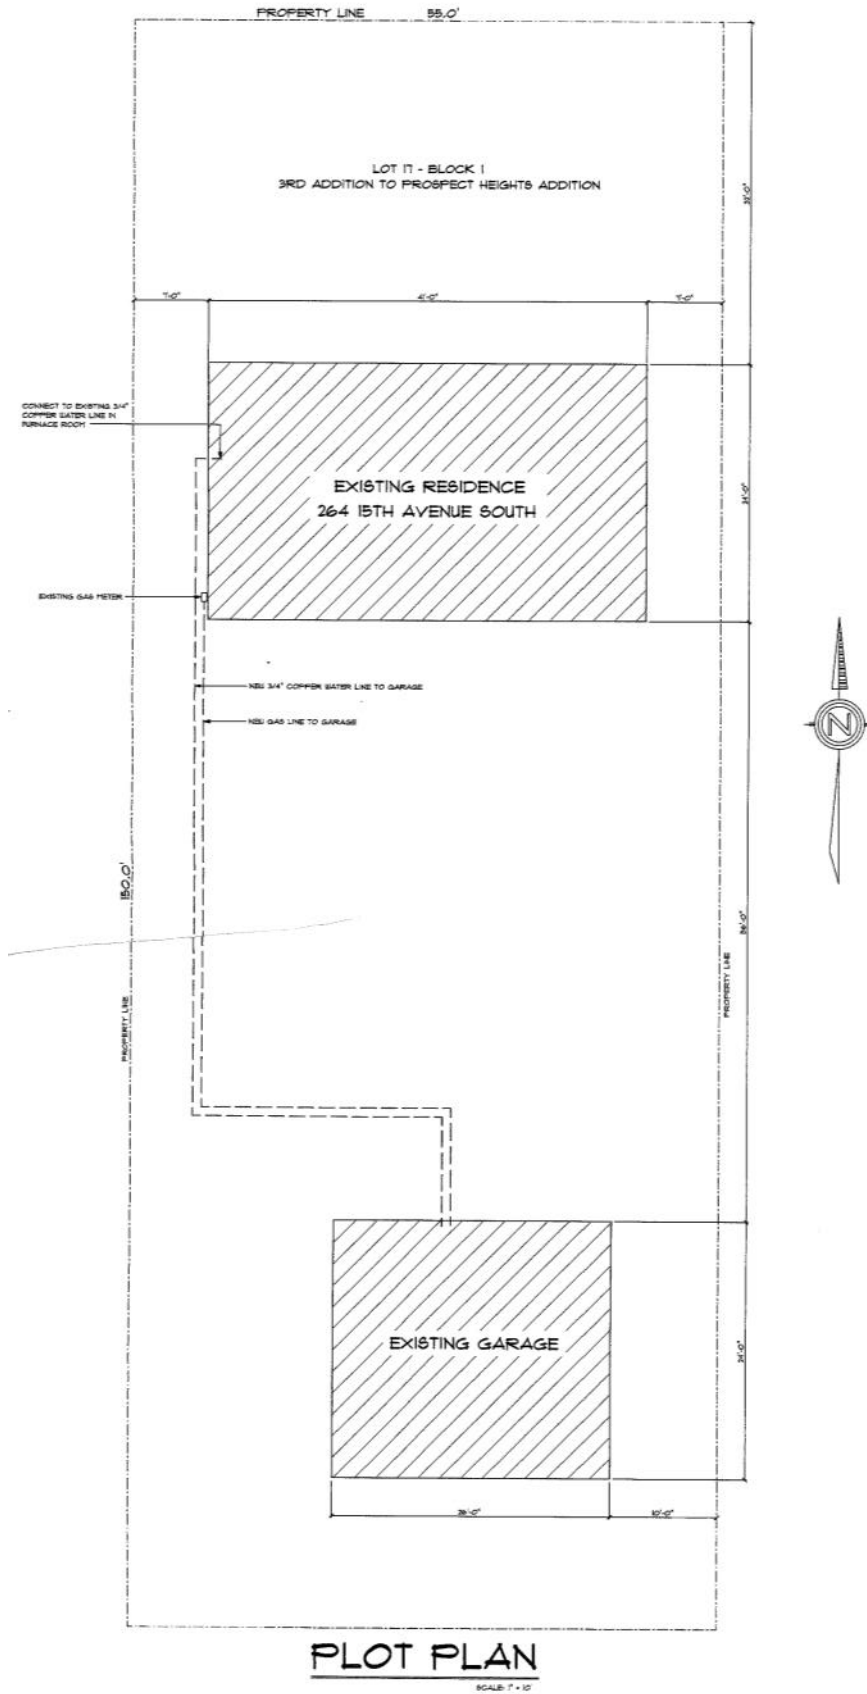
EXHIBIT F - EXISTING BUILDING PLAN (1995)
